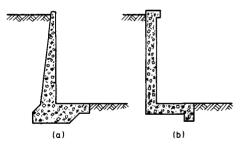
Basement floors. (a) With sloping back and heel; (b) with vertical back and no heel
